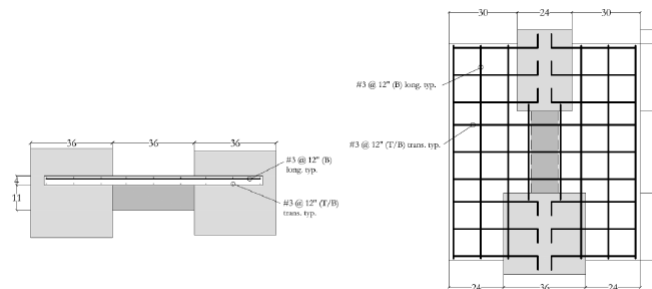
Floor slab reinforcement layout (typical) (Naish et al. 2009) – Dimensions in inches.
